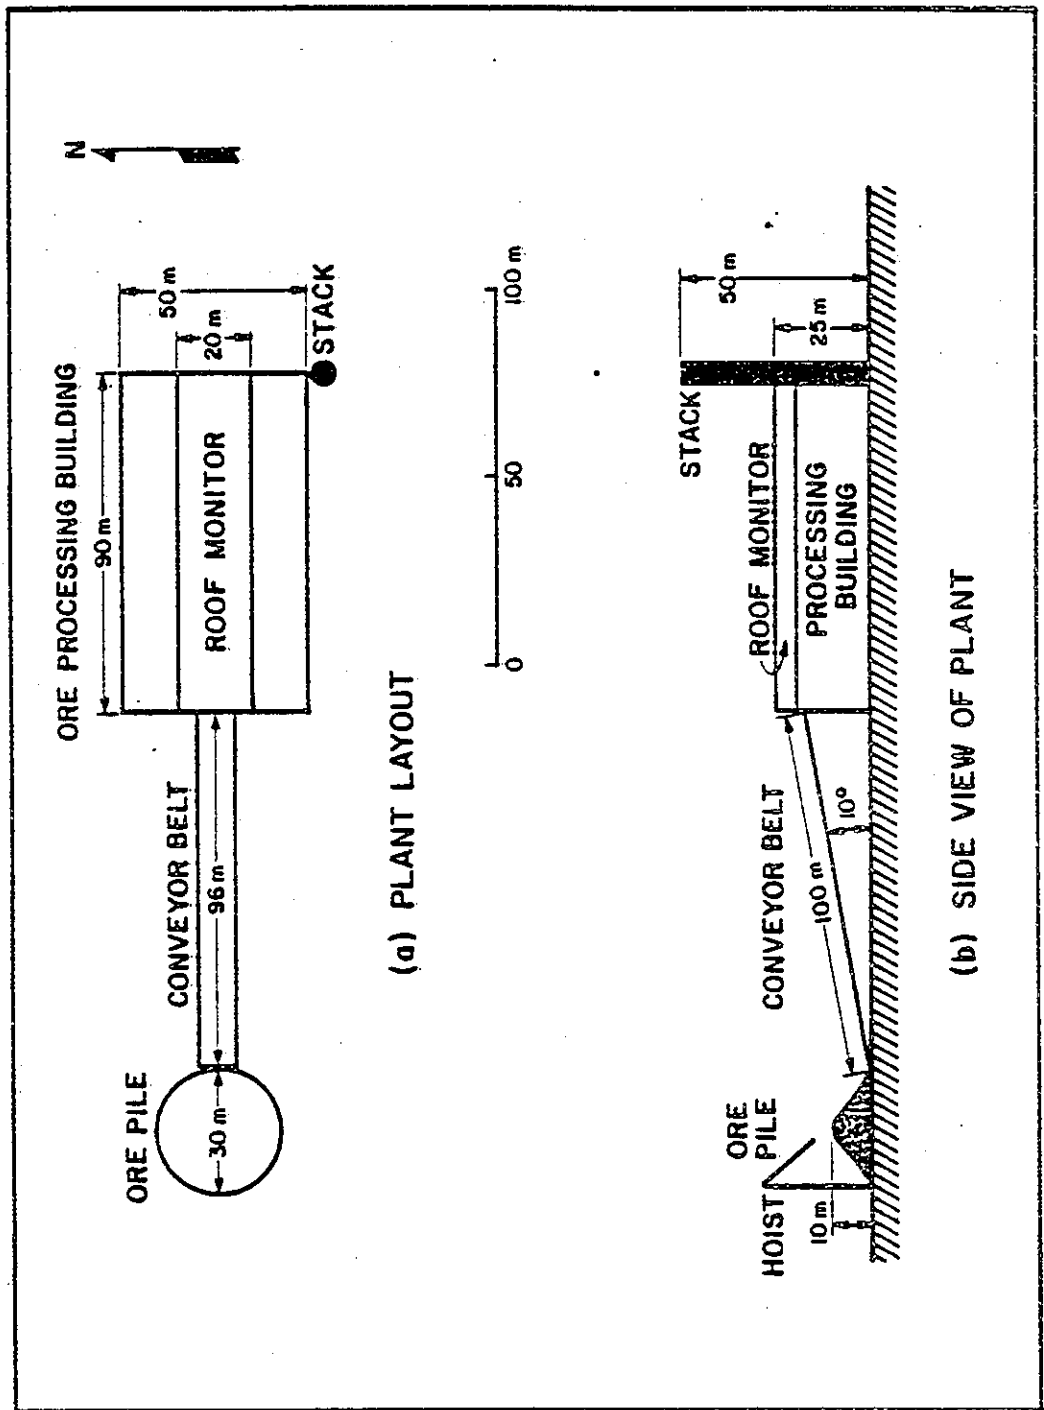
Plant layout and side view of a hypothetical potash processing plant.
